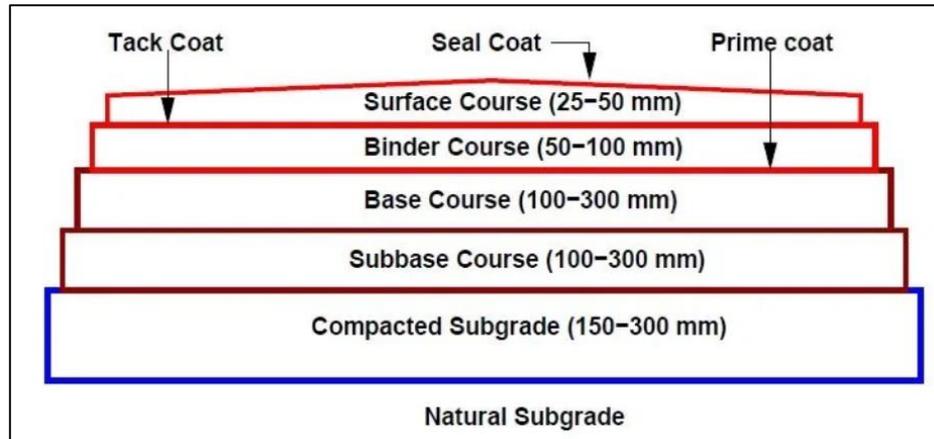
Flexible Pavement Cross Section (Tensar, 2021).
